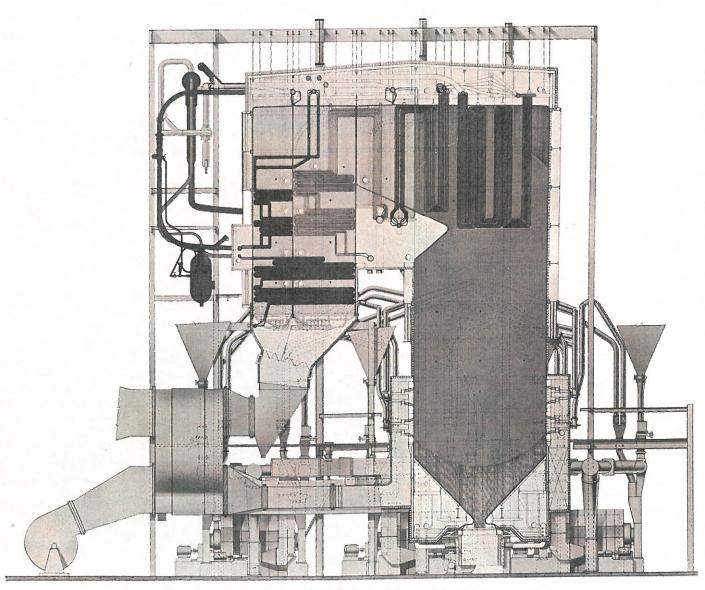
SIDE ELEVATION, WATEREE STATION UNIT NO. 1
